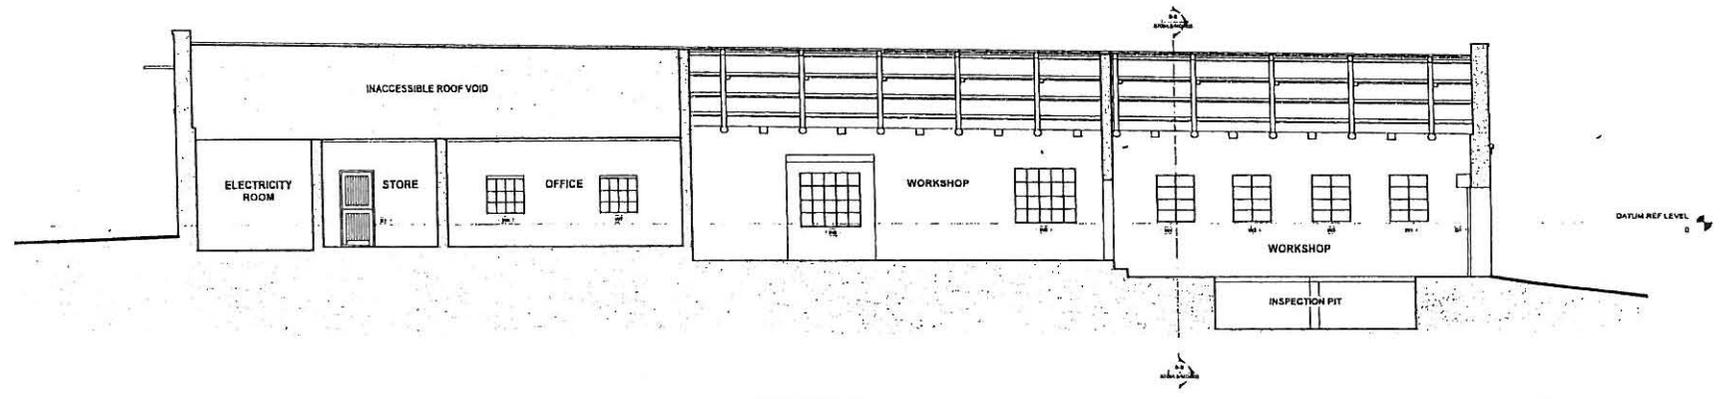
Site plan of the existing Barn as documented by the architect, with functional room layout (Architect Goddard 2008).
